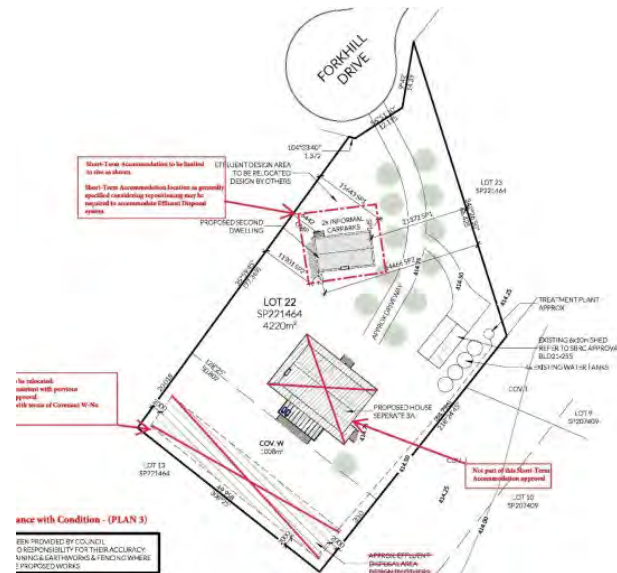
Approved Short-term accommodation location on site plan at file MCU22/0022 (redline box). Note there was an existing shed fitted out for habitation at the time of MCU22/0022's approval (as shown).
